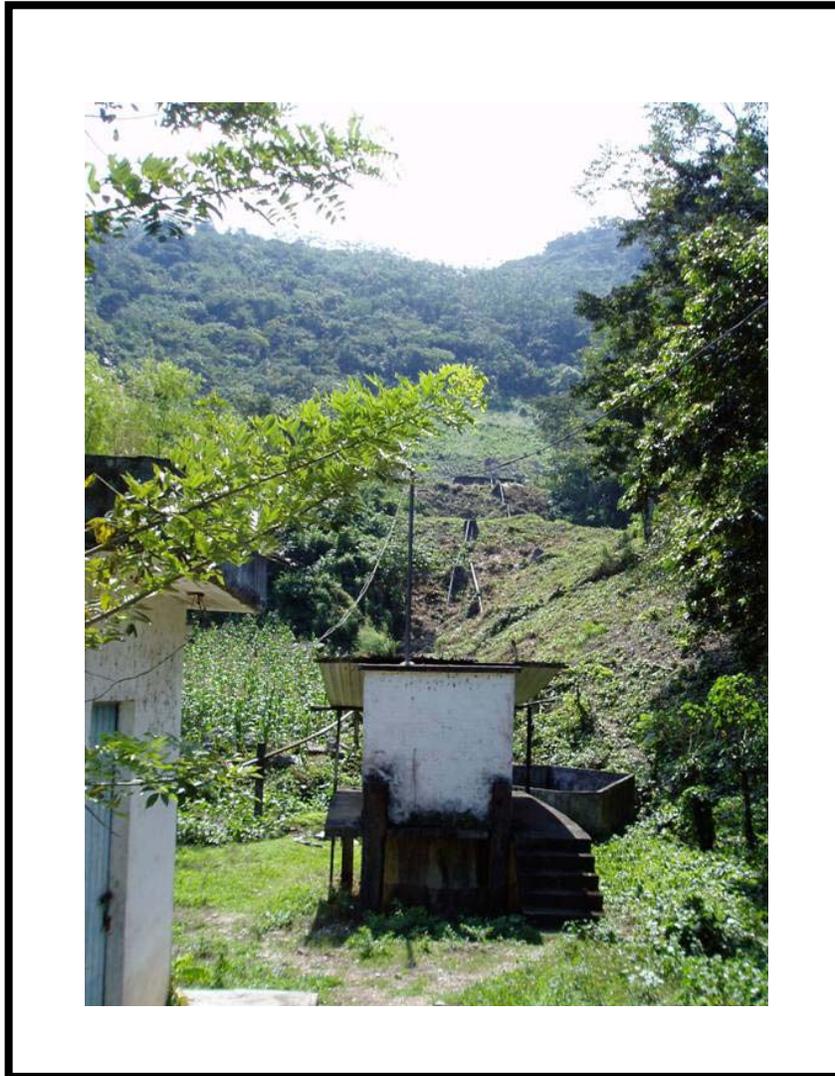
View of the existing water pumping station for the communities of Los Reyes and Santa Ursula, located on the banks of the Arroyo Sal. This water system will be replaced by a new system as part of the Project.
